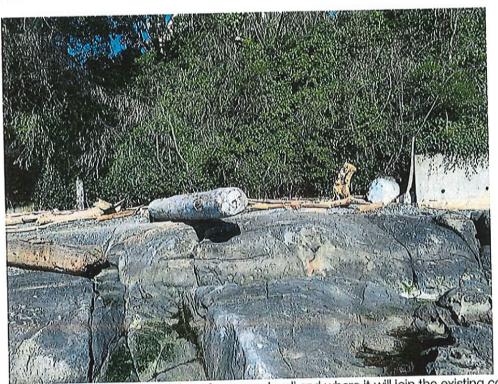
South eastern section of proposed wall and where it will join the existing concrete wall at the end of the road right-of-way.
